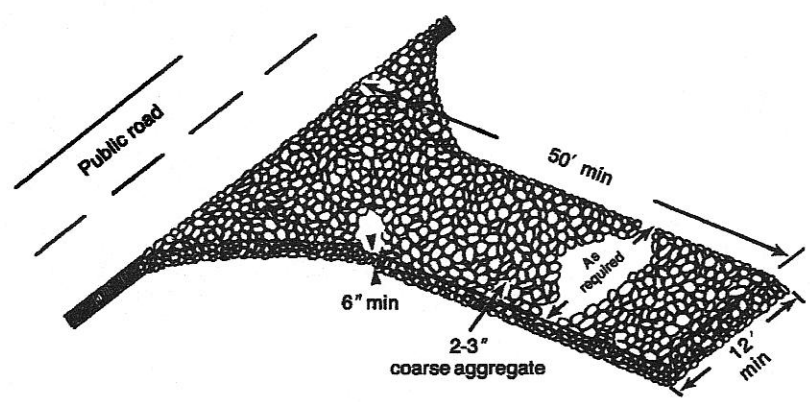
Gravel entrance/exit heape sediment from leaving the construction site (modified from NCESB/CES).
